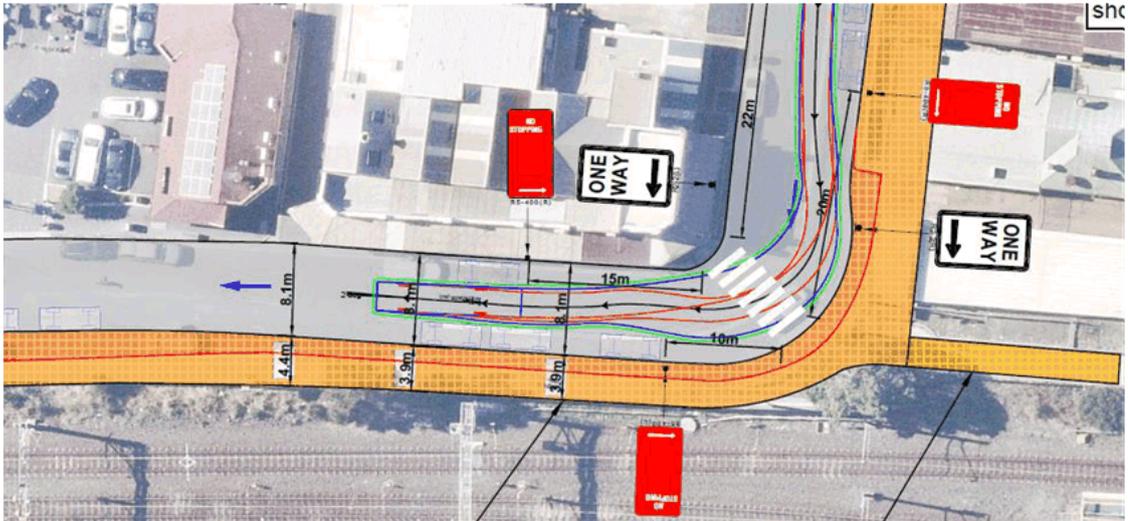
Swept Path plan of a 12.5m long rigid bus travelling through the bend between Station Street East and Marion Street, Harris Park
